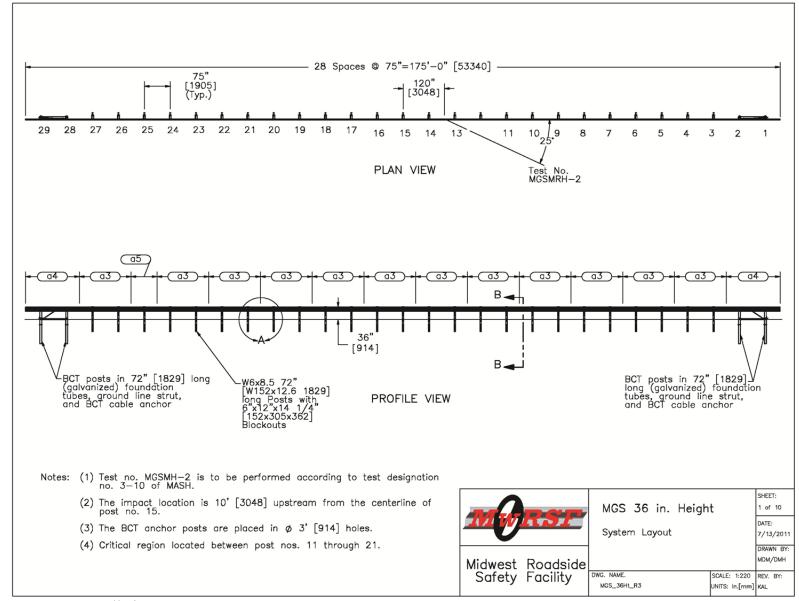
Test Installation Layout, Test No. MGSMRH-2
